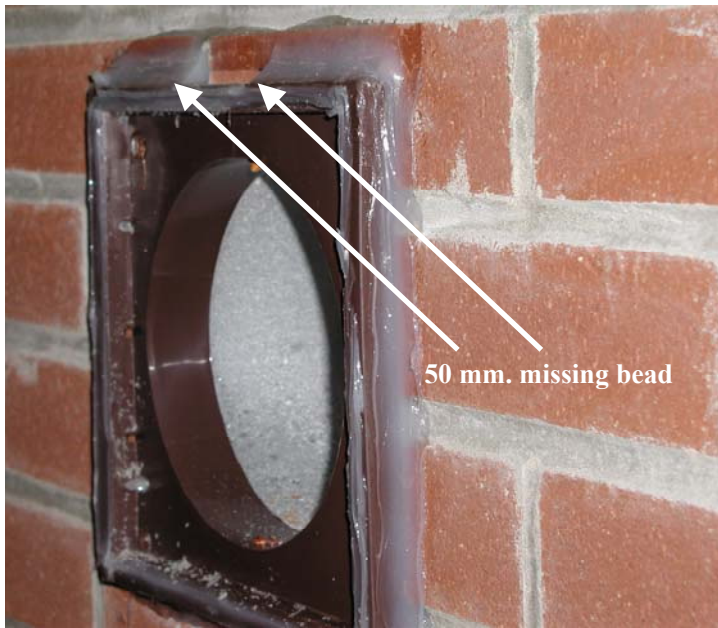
Examples of a missing length of a bead of sealant (deficiency) at the cladding/duct cover plate joint in a masonry wall specimen
